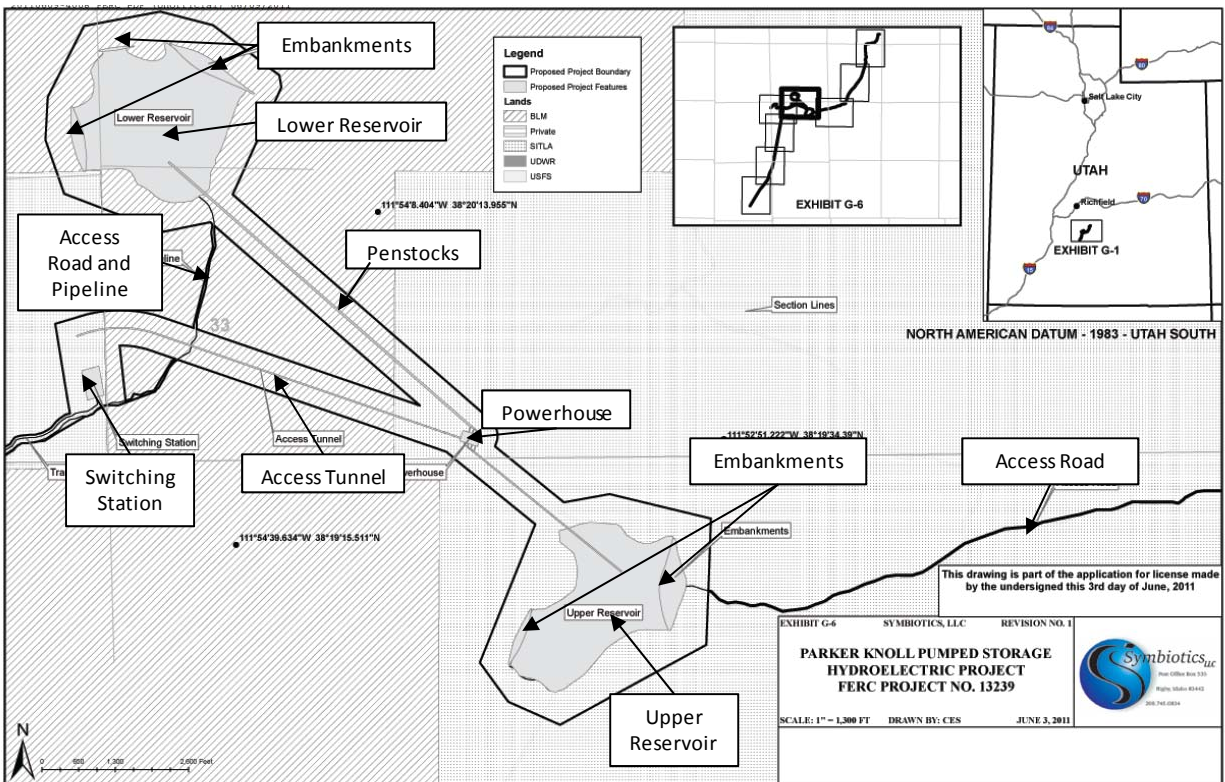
Parker Knoll Site Layout (Parker Knoll DLA)
